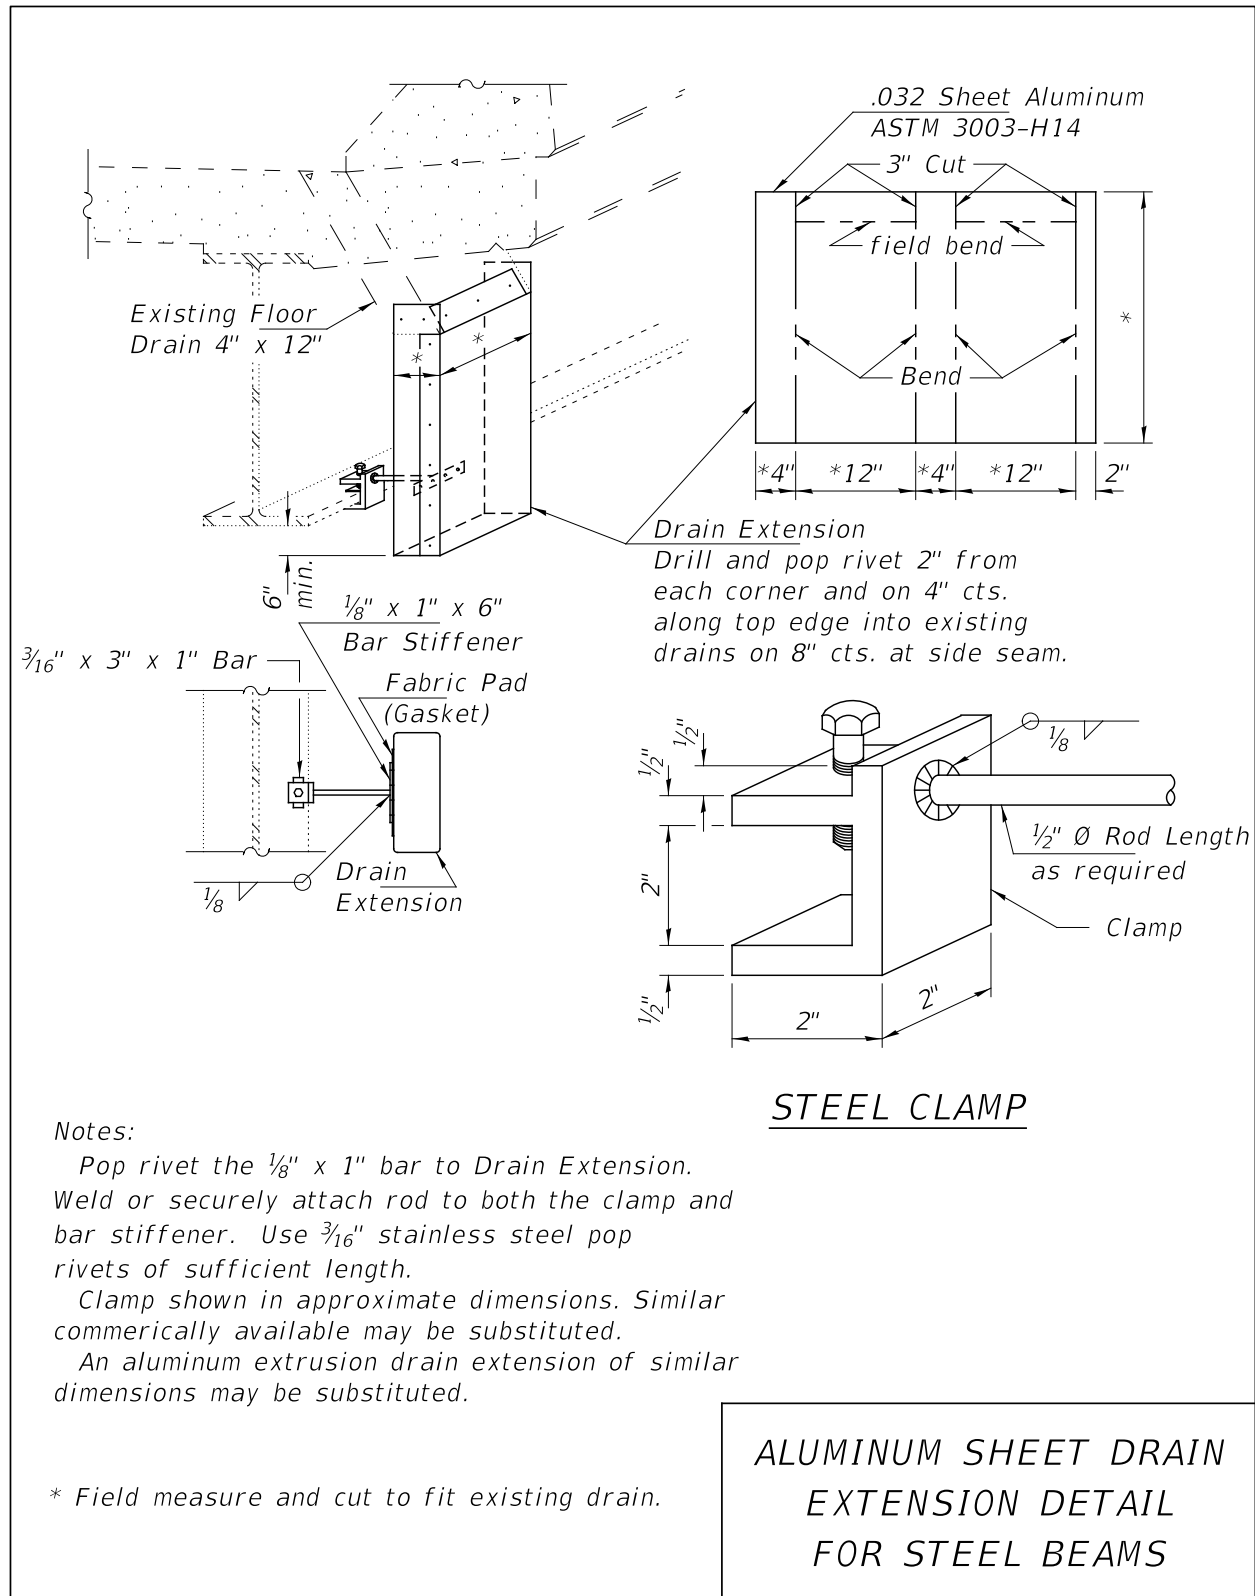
Aluminum Sheet Drain Extension Detail for Steel Beams
